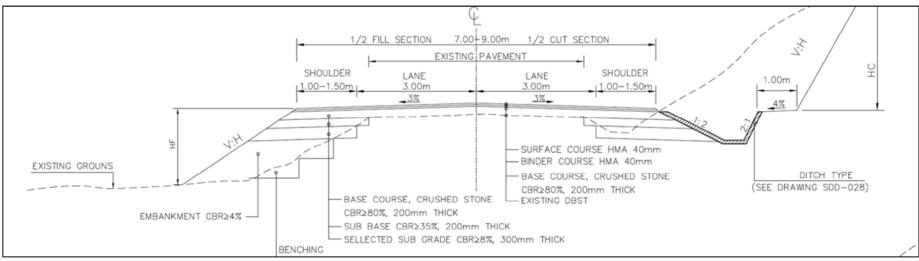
Cross Section Through Village Area in Flat and Rolling (TC2)
